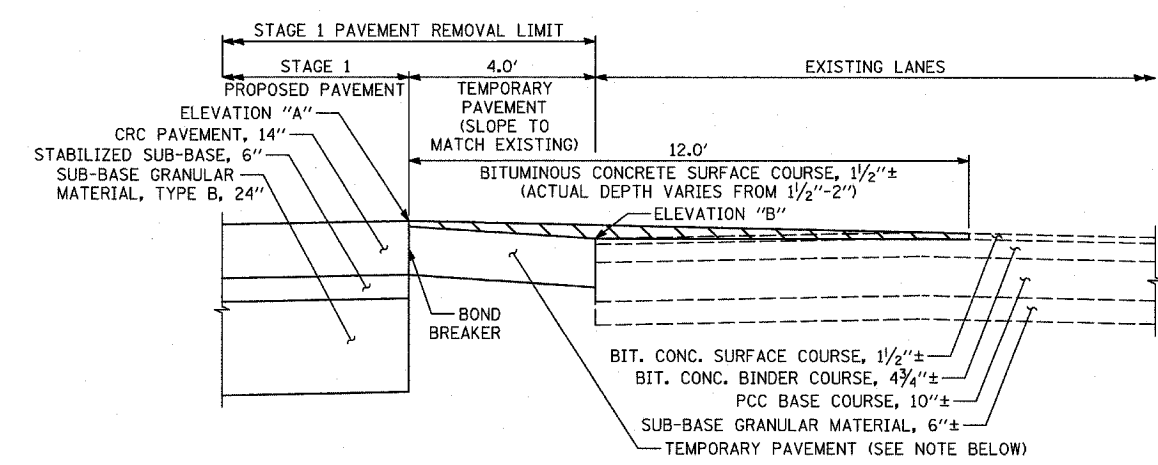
DETAIL OF MAINLINE TEMPORARY PAVEMENT FOR POST-STAGE 1 WINTER LANE CONFIGURATION
